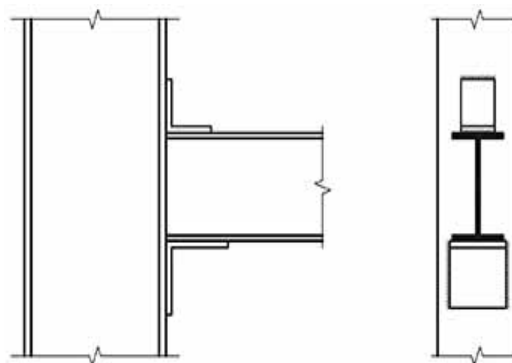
The schematic of beam-to-column connections with welded angle seat
